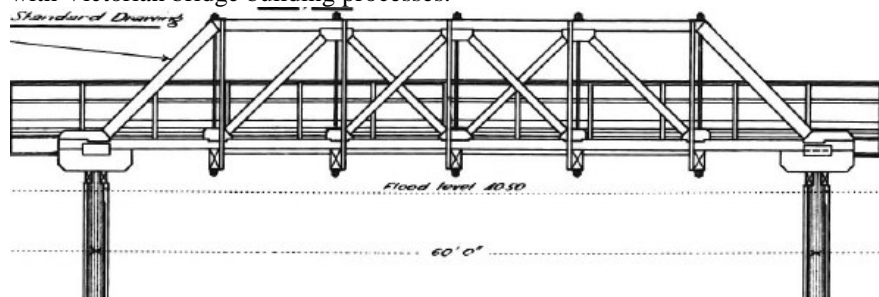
Plan of Bridge over Broken River, Victoria built 1928 (VicRoads Archives).
